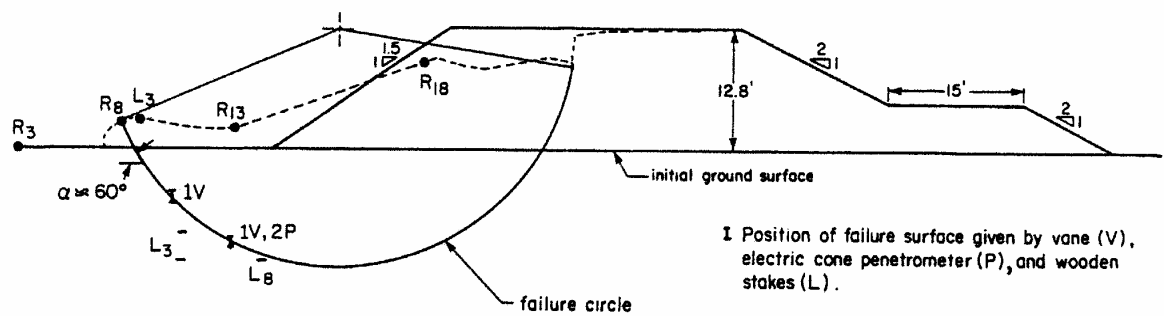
Pre and post-failure geometry of St. Alban-A test embankment (La Rochelle et al 1974)
